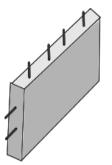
Adobe Masonry wall with steel bar reinforcement. (By Author)
